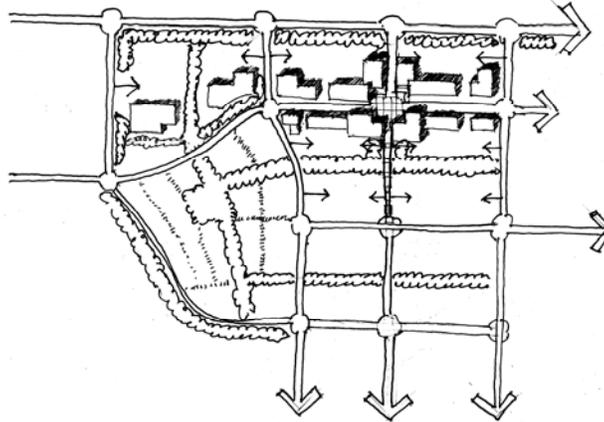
Master plan roadway, access, and parking concept for SD-4. This layout illustrates a desirable hierarchy of internal streets, future roadway connections, parking areas, and access points. (GRAPHIC TO BE UPDATED FOR THE OPEN HOUSE)
